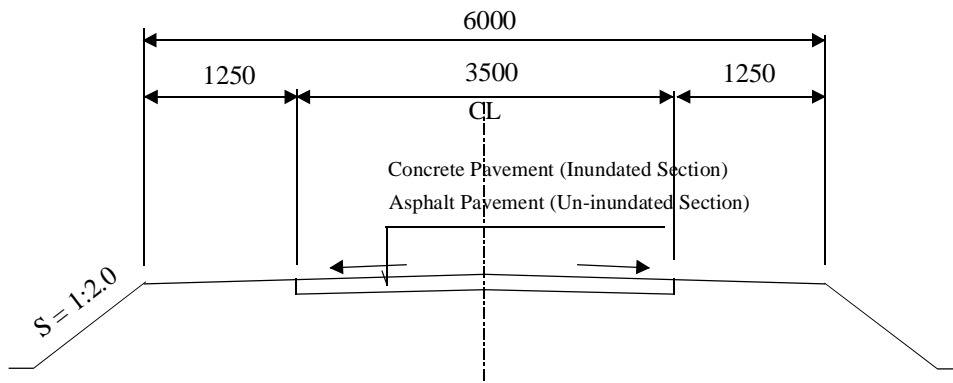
Road Classification VI (KPC Road) on Embankment Section
